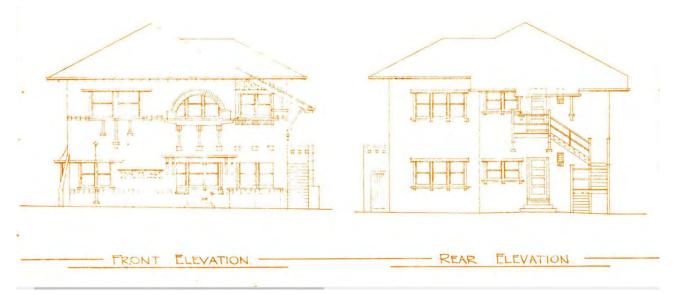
Figure I — Original elevation plans show a mirror image of the building, as constructed, with the stairs on the north side. The internal layout was similarly 'flipped'. (Source: Port Phillip building file)
